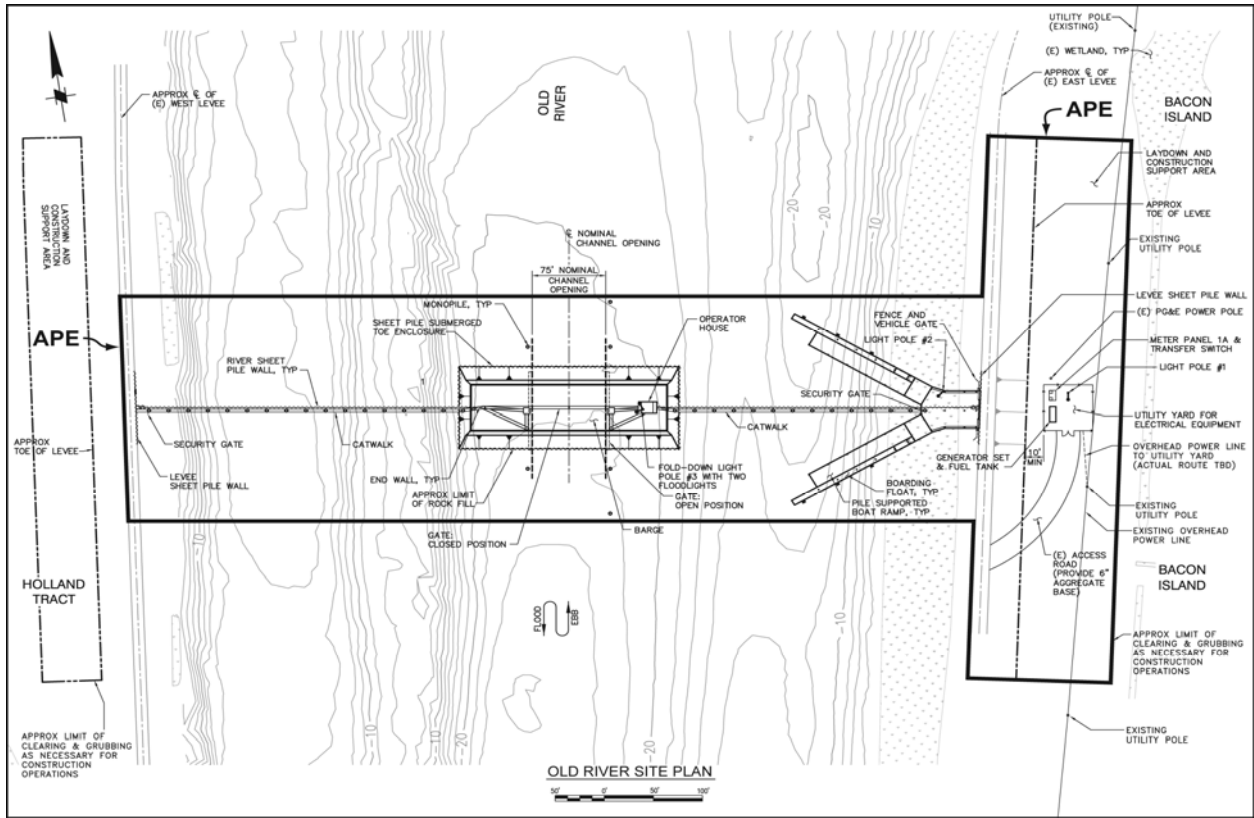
Old River Site Plan View and Area of Potential Effects
